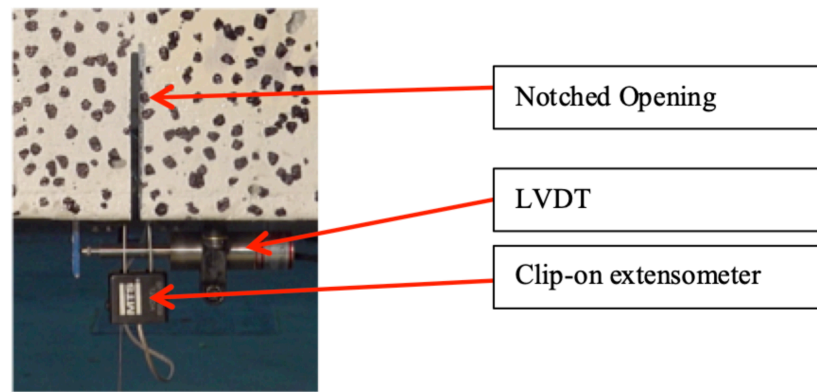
Crack opening instrumentation: LDVT and extensometer.
